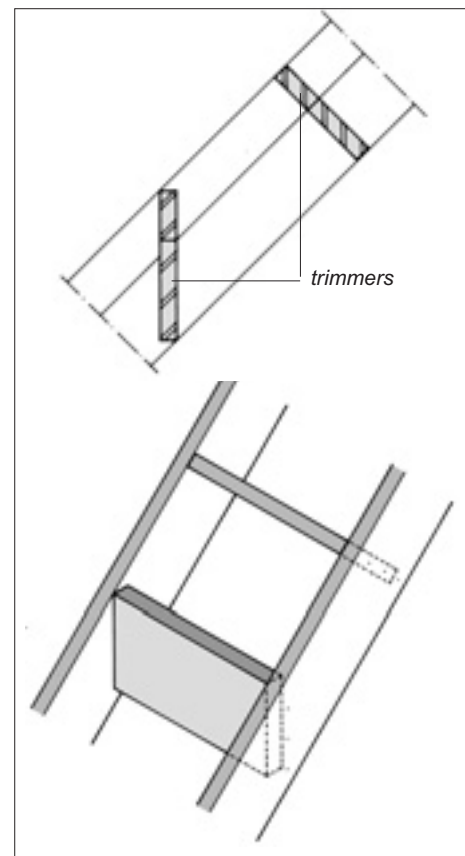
a and b. Openings for vertical shafts, dormer windows etc. are made similarly to intermediate floor openings.
